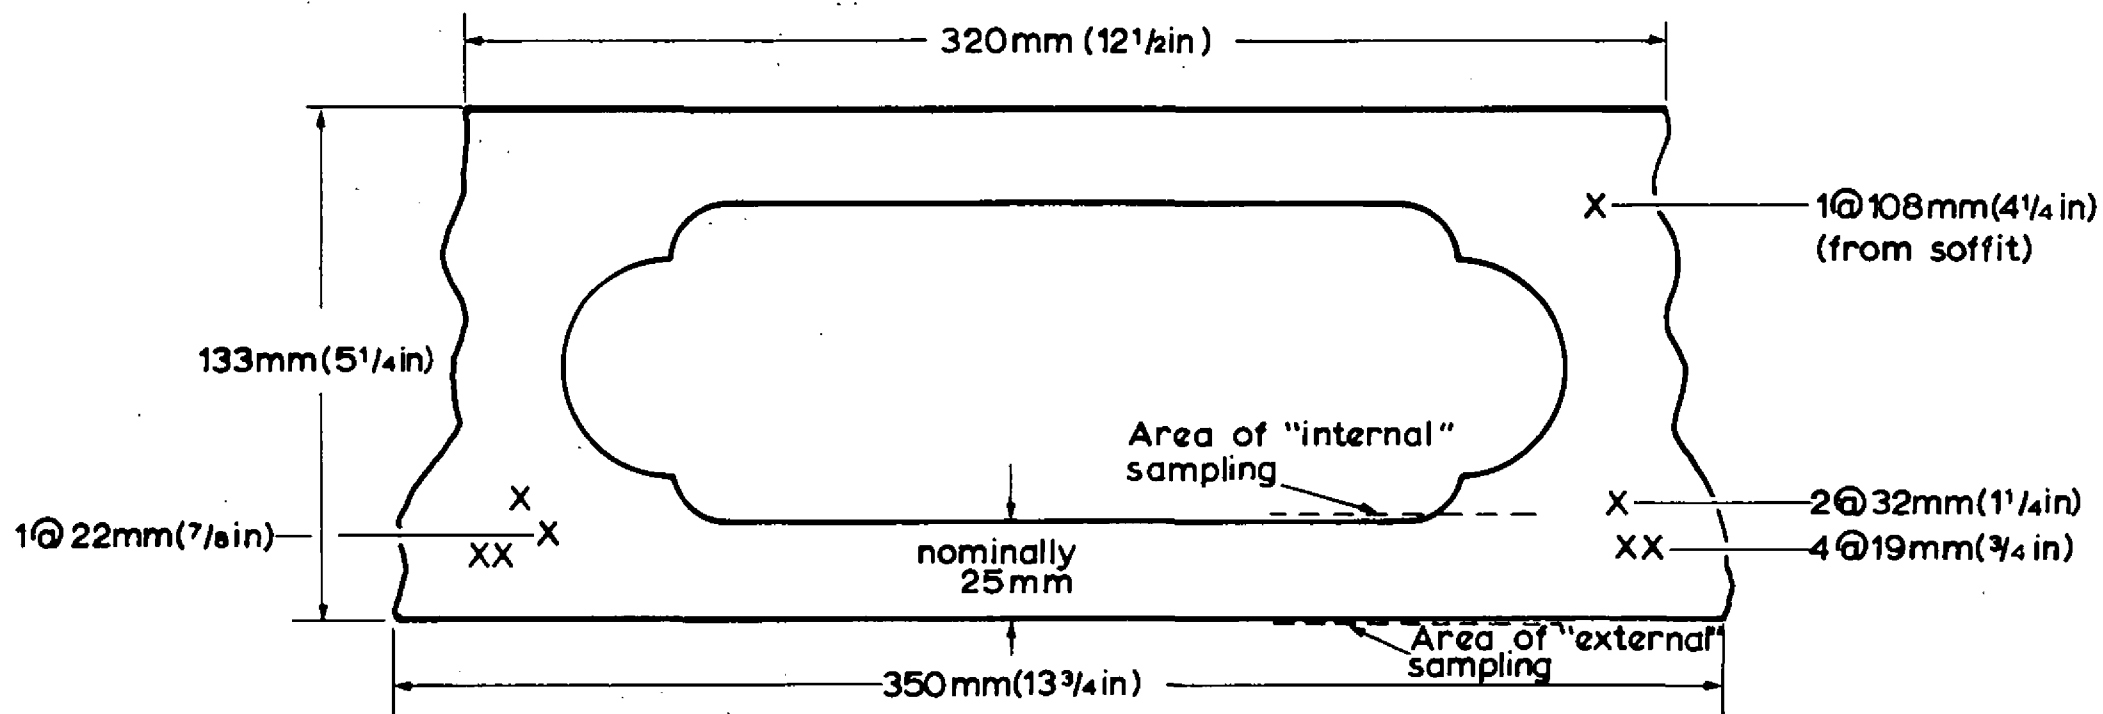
Section through 133mm (5 1/4 in) prestressed concrete floor units showing manufacturers stated positions of 8 No 10 SWG wires
